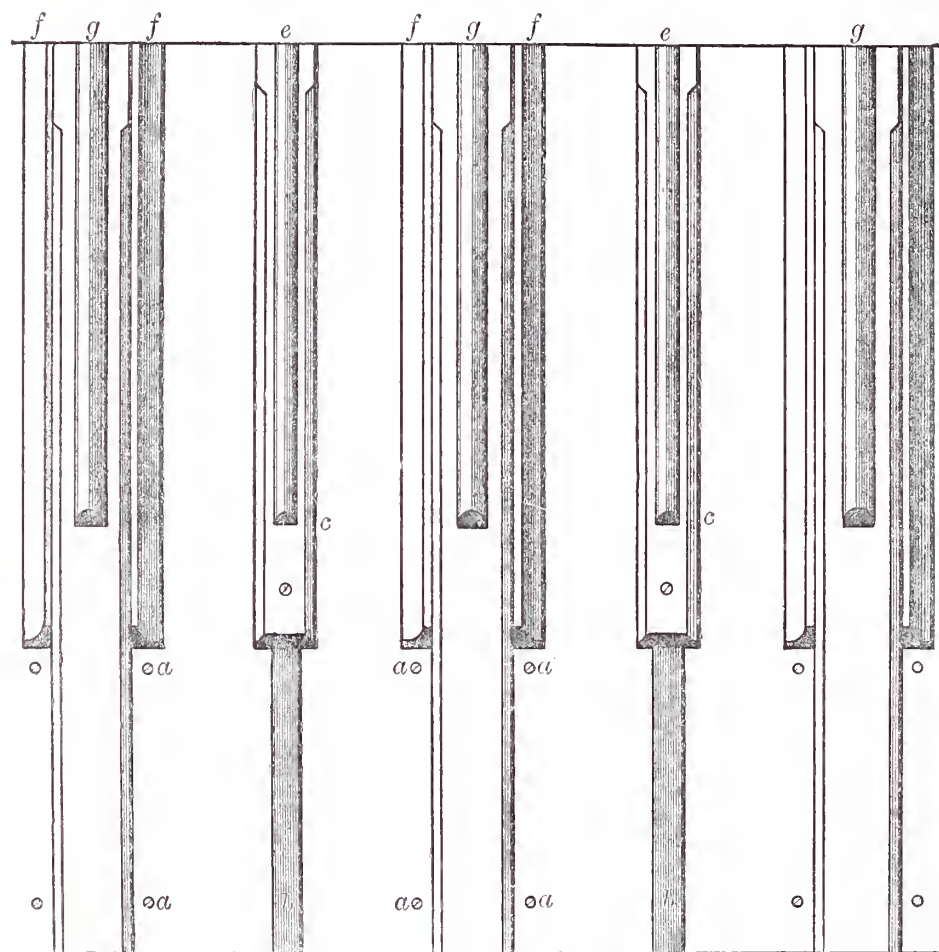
Wood Ceiling with Floor above, in Plan.
